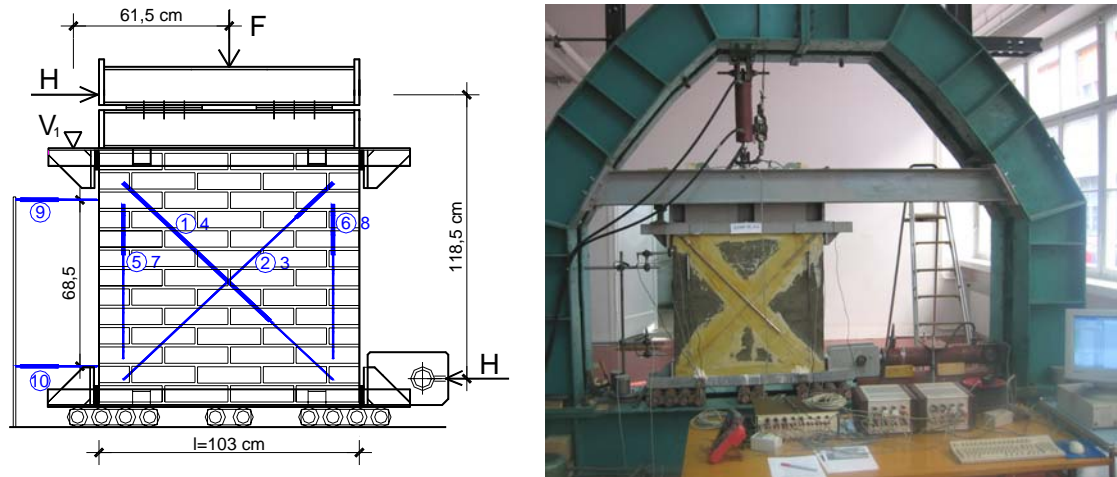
Left) positions of horizontal (H at bottom right) and vertical (F) hydraulic jacks and LVDTs at masonry wall specimen. Right) photo of steel testing frame with position of wall specimen strengthened with horizontal and diagonal glass fiber straps
